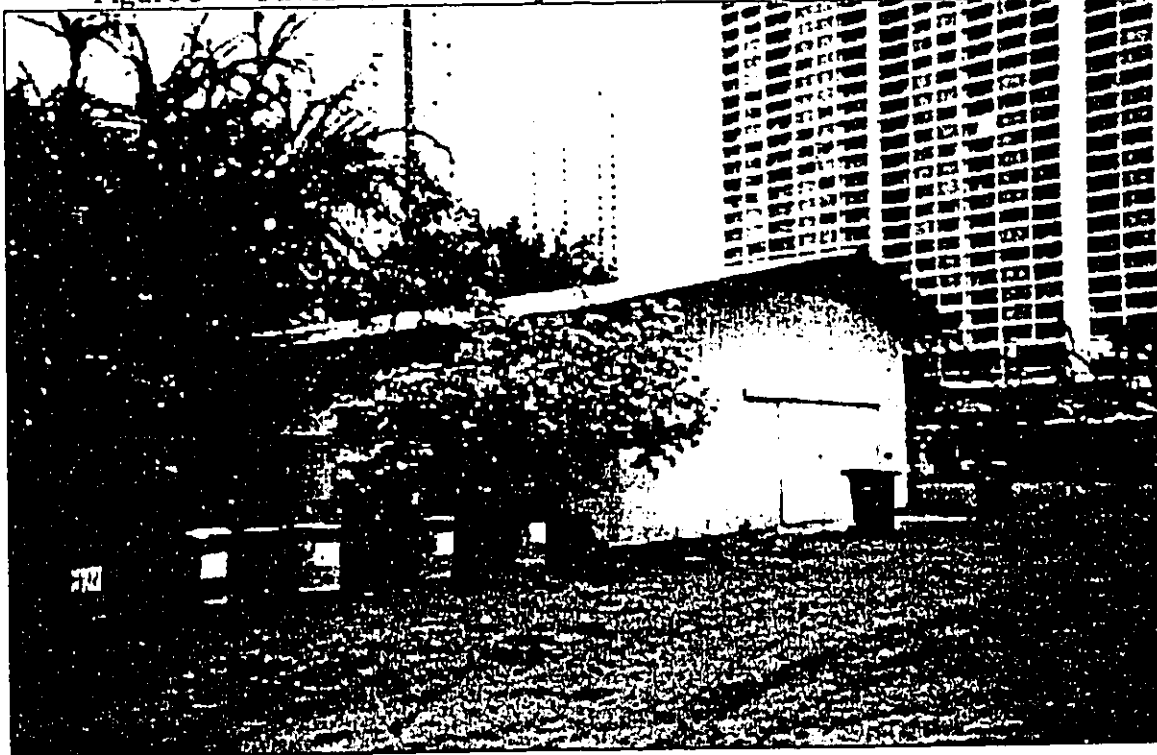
Metal Shed on Paved Portion of Project Area, View to the Southwest
